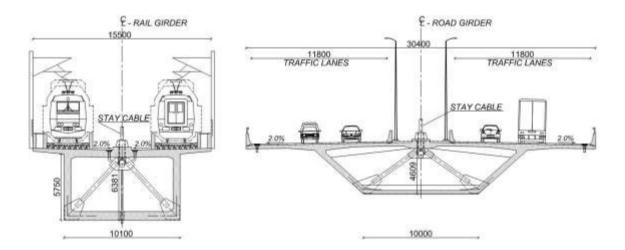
Puente Nigale, typical cross section in the two parallel main bridges across the navigation channel. Dimensions in [mm].
